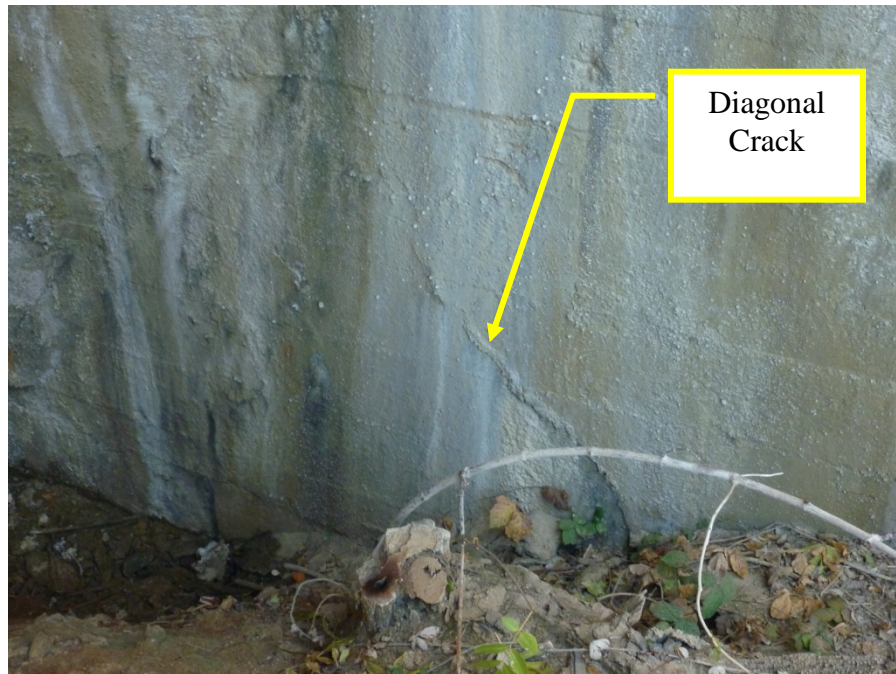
Left Buttress Wall of Arch #5 with Diagonal Crack
